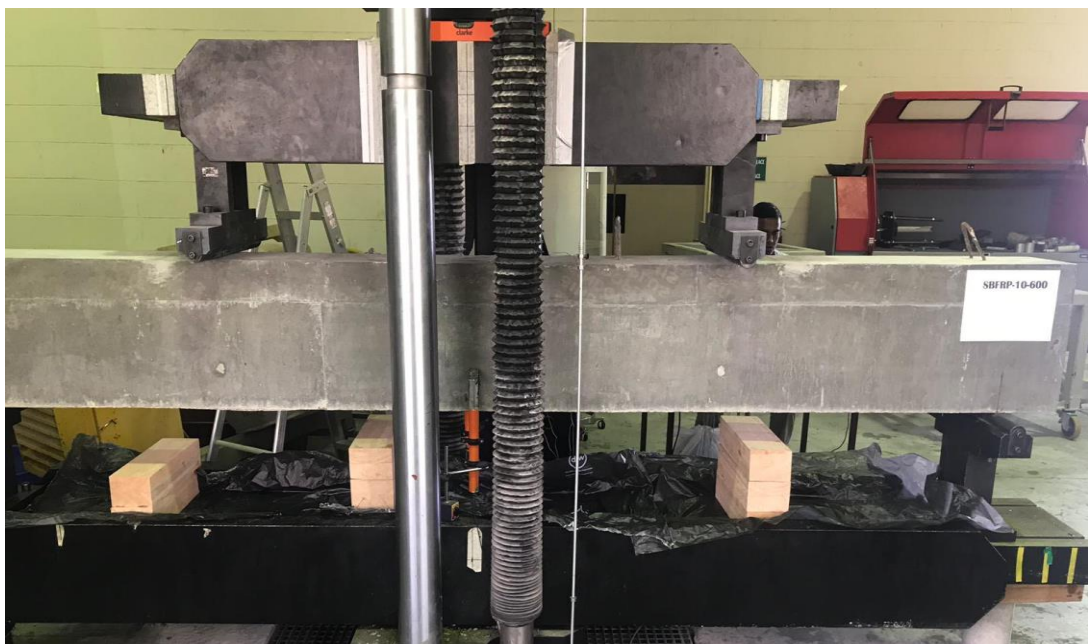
Beam 2 (SBFRP-10-600) testing setup
